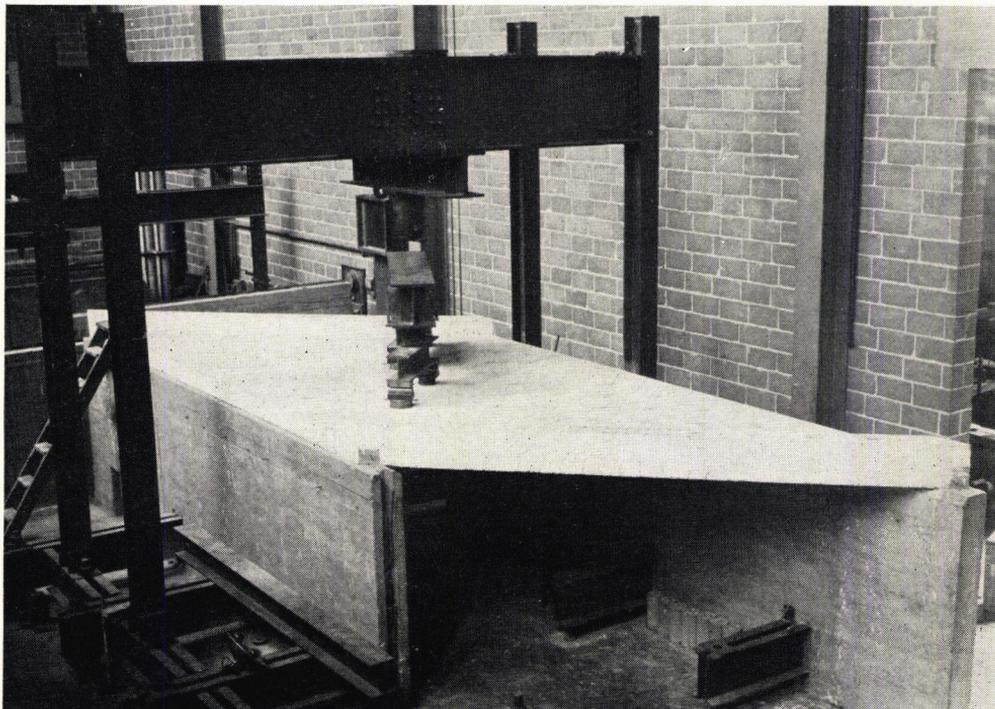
Test of a half-scale model of a 45-deg.-skew slab bridge with curbs. The model has a span of 9.75 feet and a clear roadway width of 13 feet. Four loads representing two heavy axes are being applied in the midspan region.
